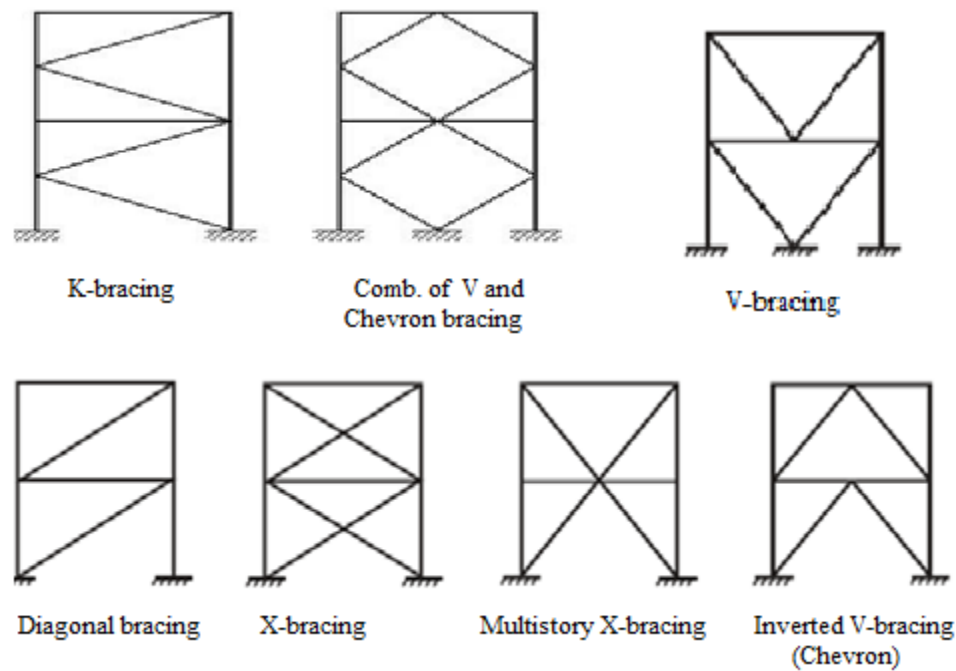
Different types of concentrically braced frames except k-bracing and v- bracing which are eccentric bracings.
